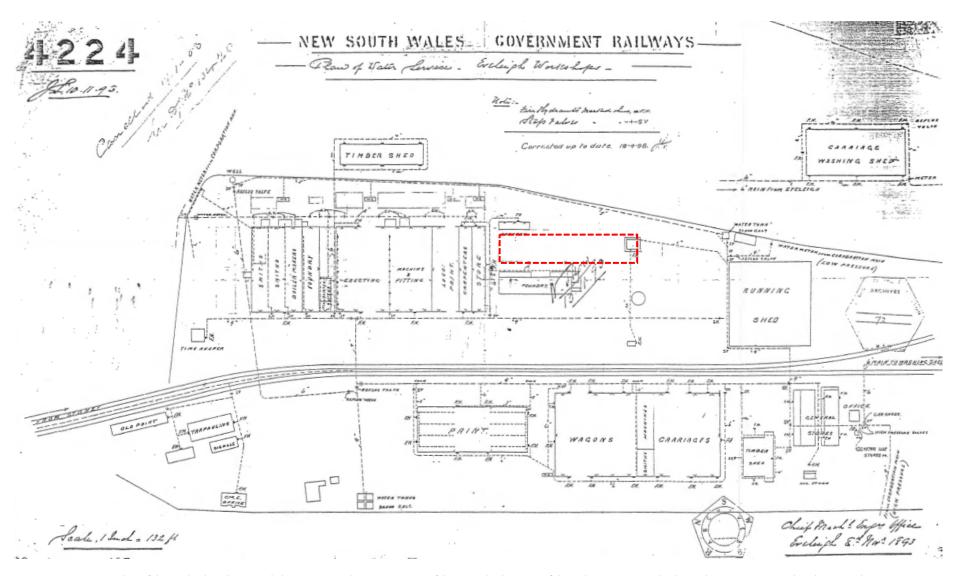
1893 Site Plan of the Eveleigh Railway Workshops prior to the construction of the LES. The location of the subject site is marked in red. Source: State Rail Authority Archives, NSW State Archives, 4224-72.
